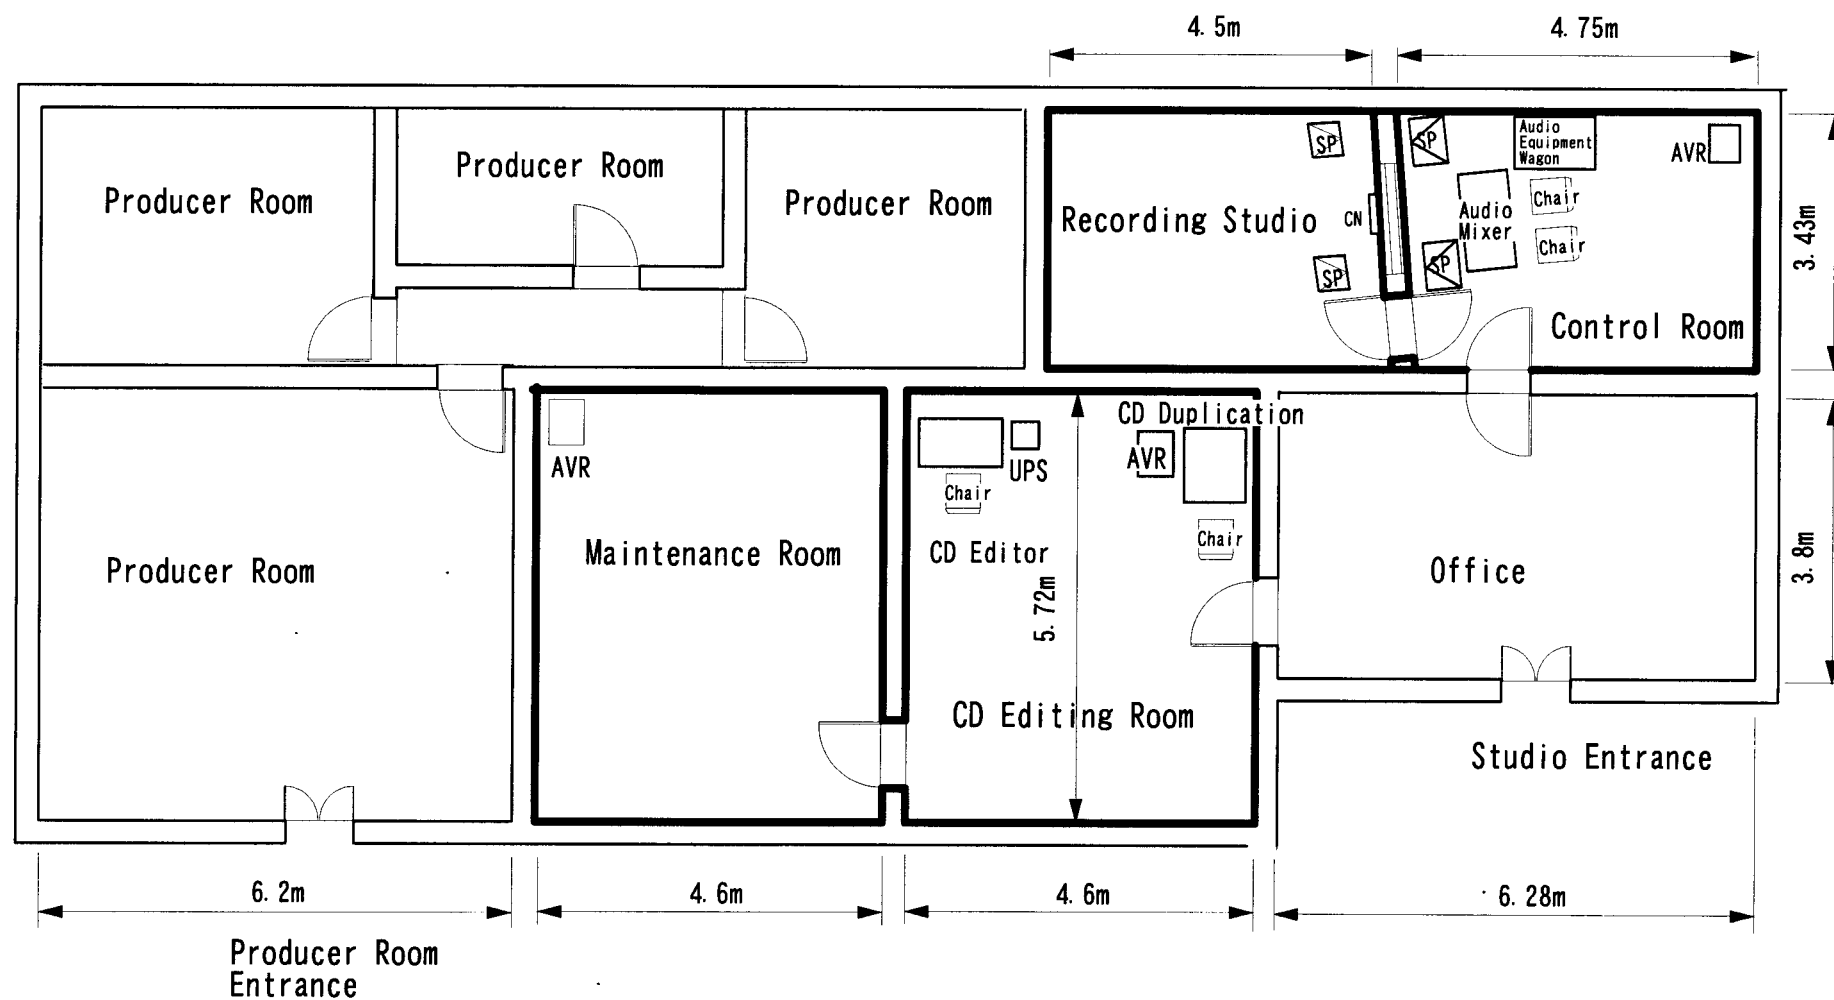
Floor Layout of Harar in Oromia Radio Studio
